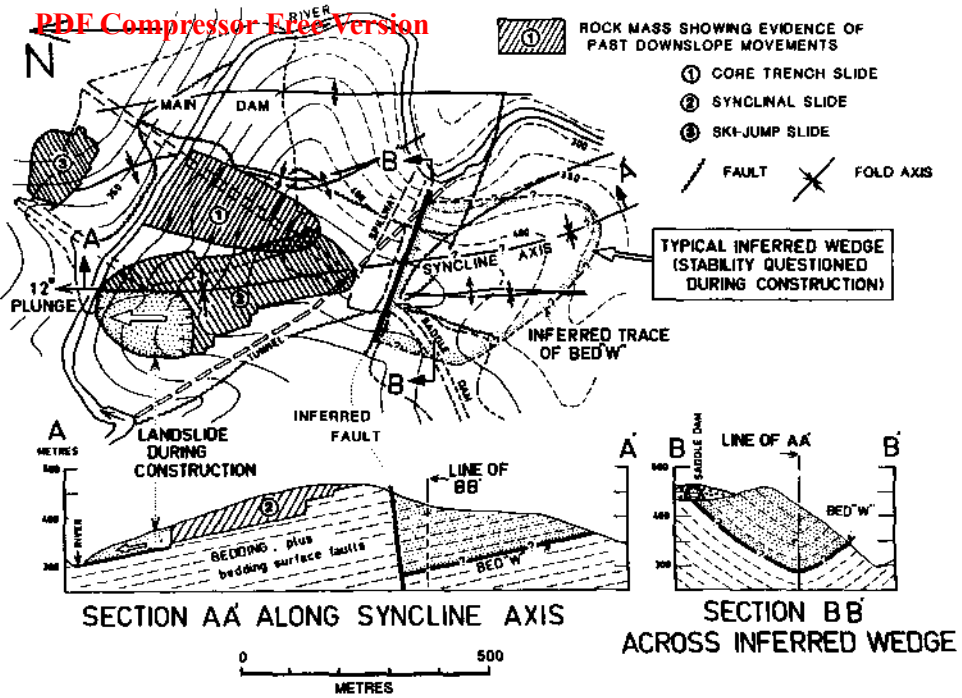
Thomson Dam site, geological plan and sections showing the main structural features.
